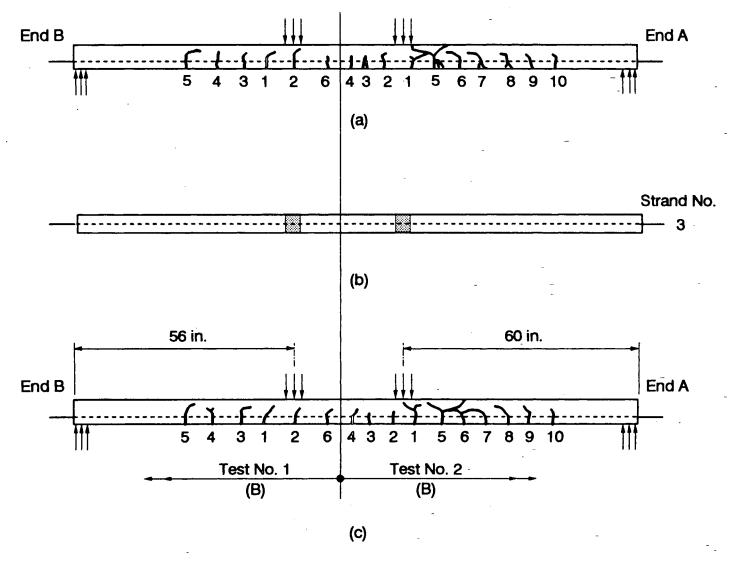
Crack patterns for D-type Specimen No. 10-6.0DU-3:
